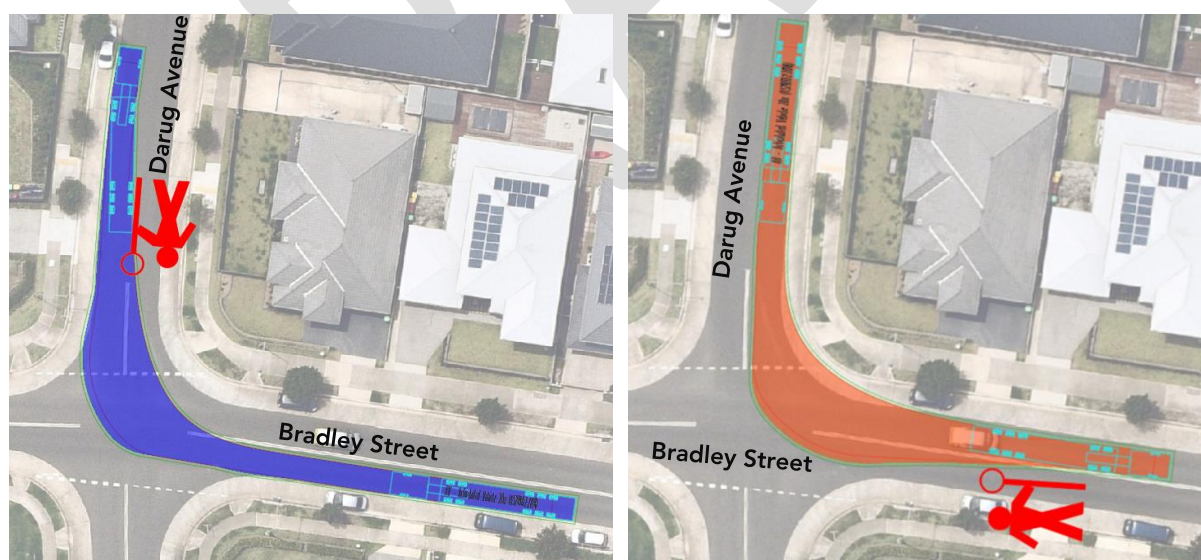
AV Swept Path at Bradley Street / Darug Avenue intersection
